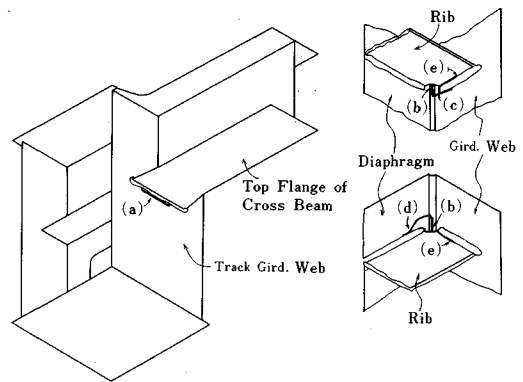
Fatigue Cracks in Test Model ST.
